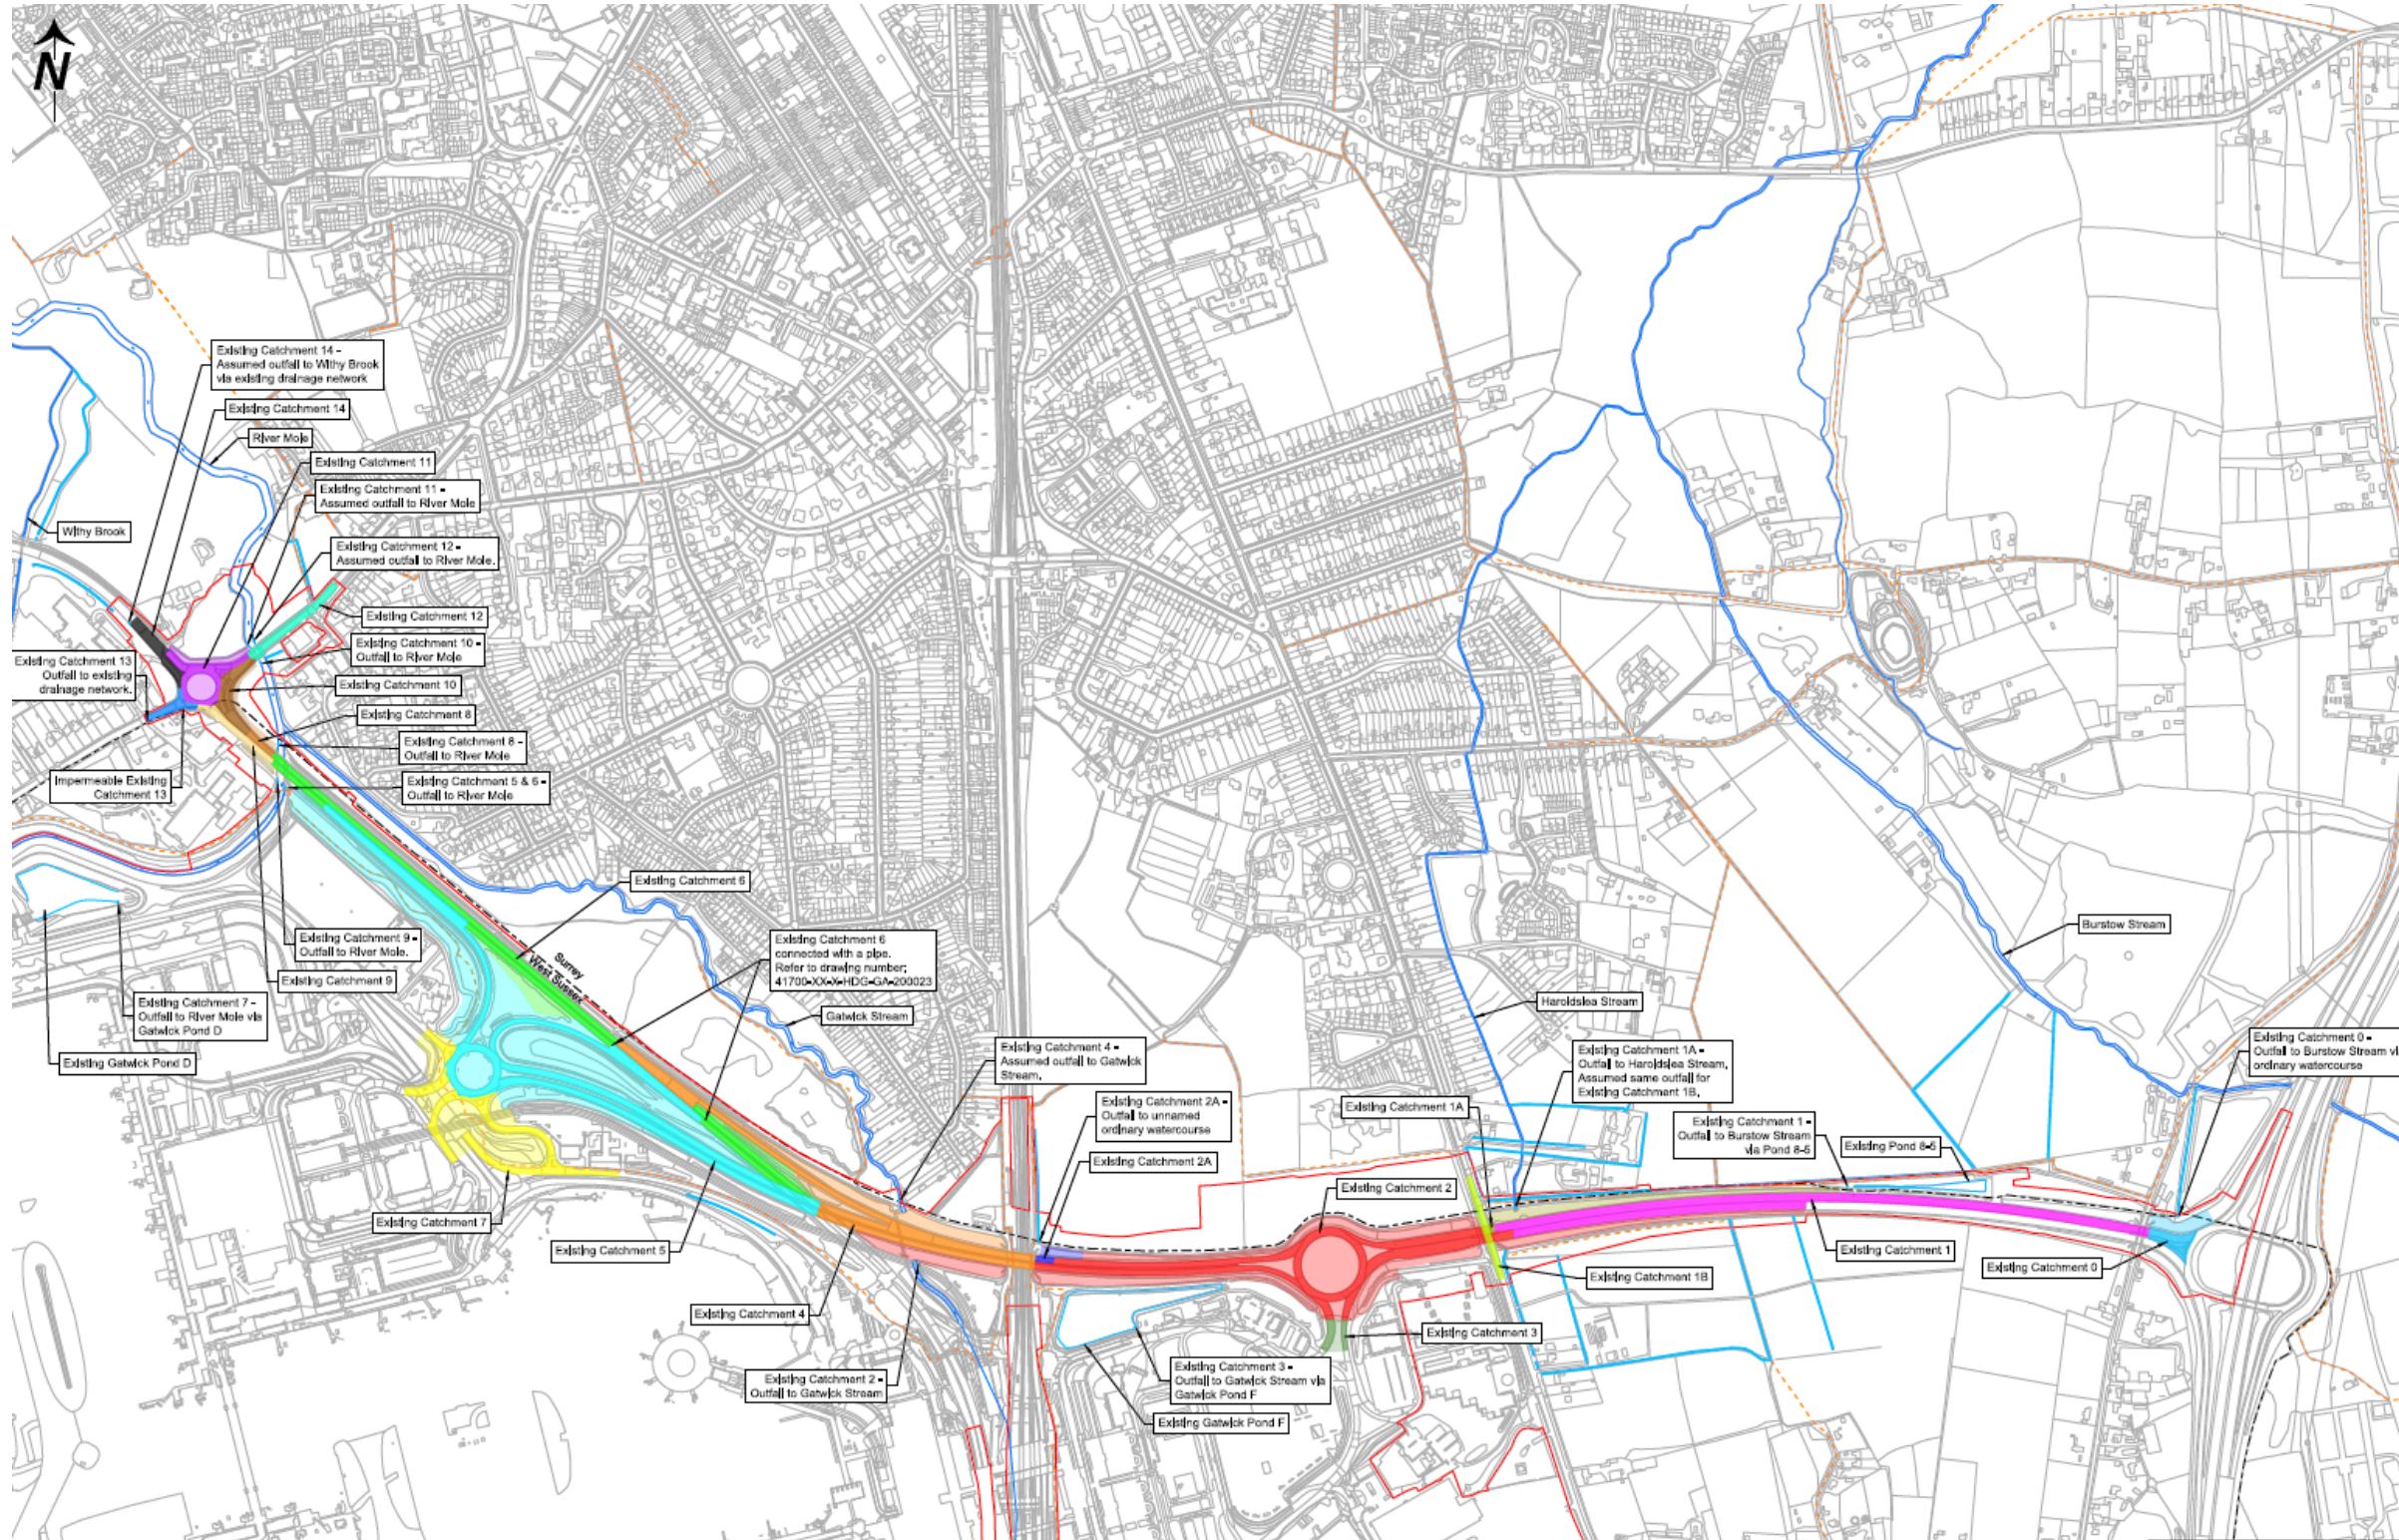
Preliminary Design Proposed South Terminal Roundabout – West Drainage Layout
